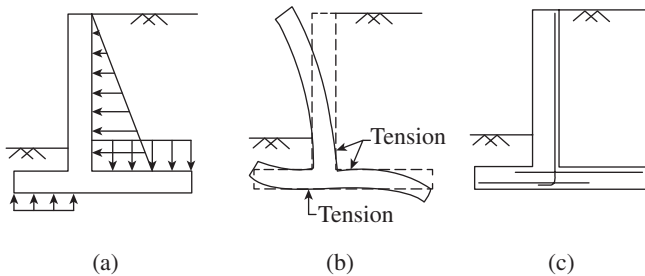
Behaviour of cantilever-retaining wall (a) Loads on stem, toe, and heel slabs (b) Deflected shape (c) Location of main reinforcement
